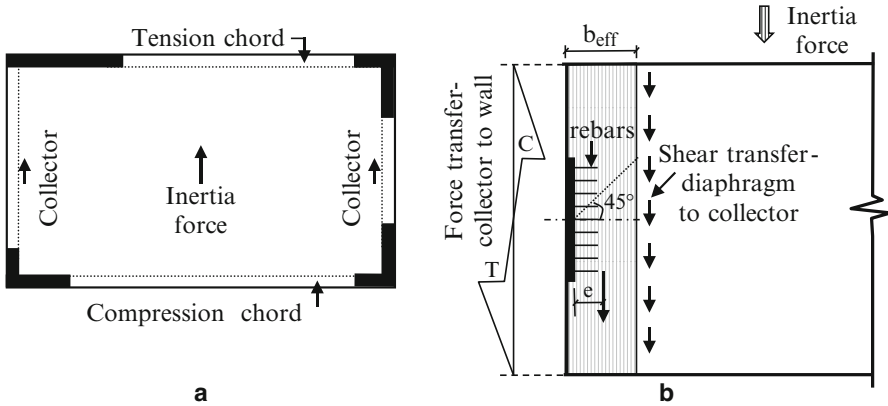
Collectors and chords. (a) General arrangement. (b) Collector wider than wall
